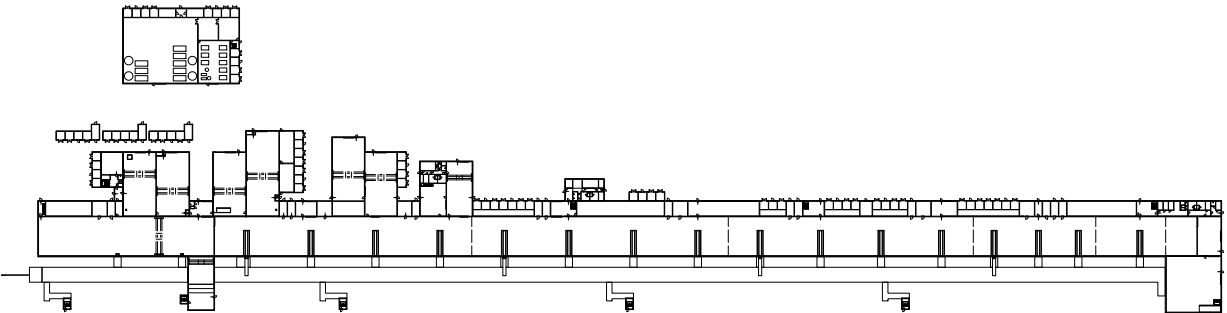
Plan view of the klystron gallery plan. The proton beam runs from the front end building on the northeast (at the right), to the target station – not shown – on the southwest (at the left). The 16 underground stubs that connect the tunnel and the klystron gallery are shown.
